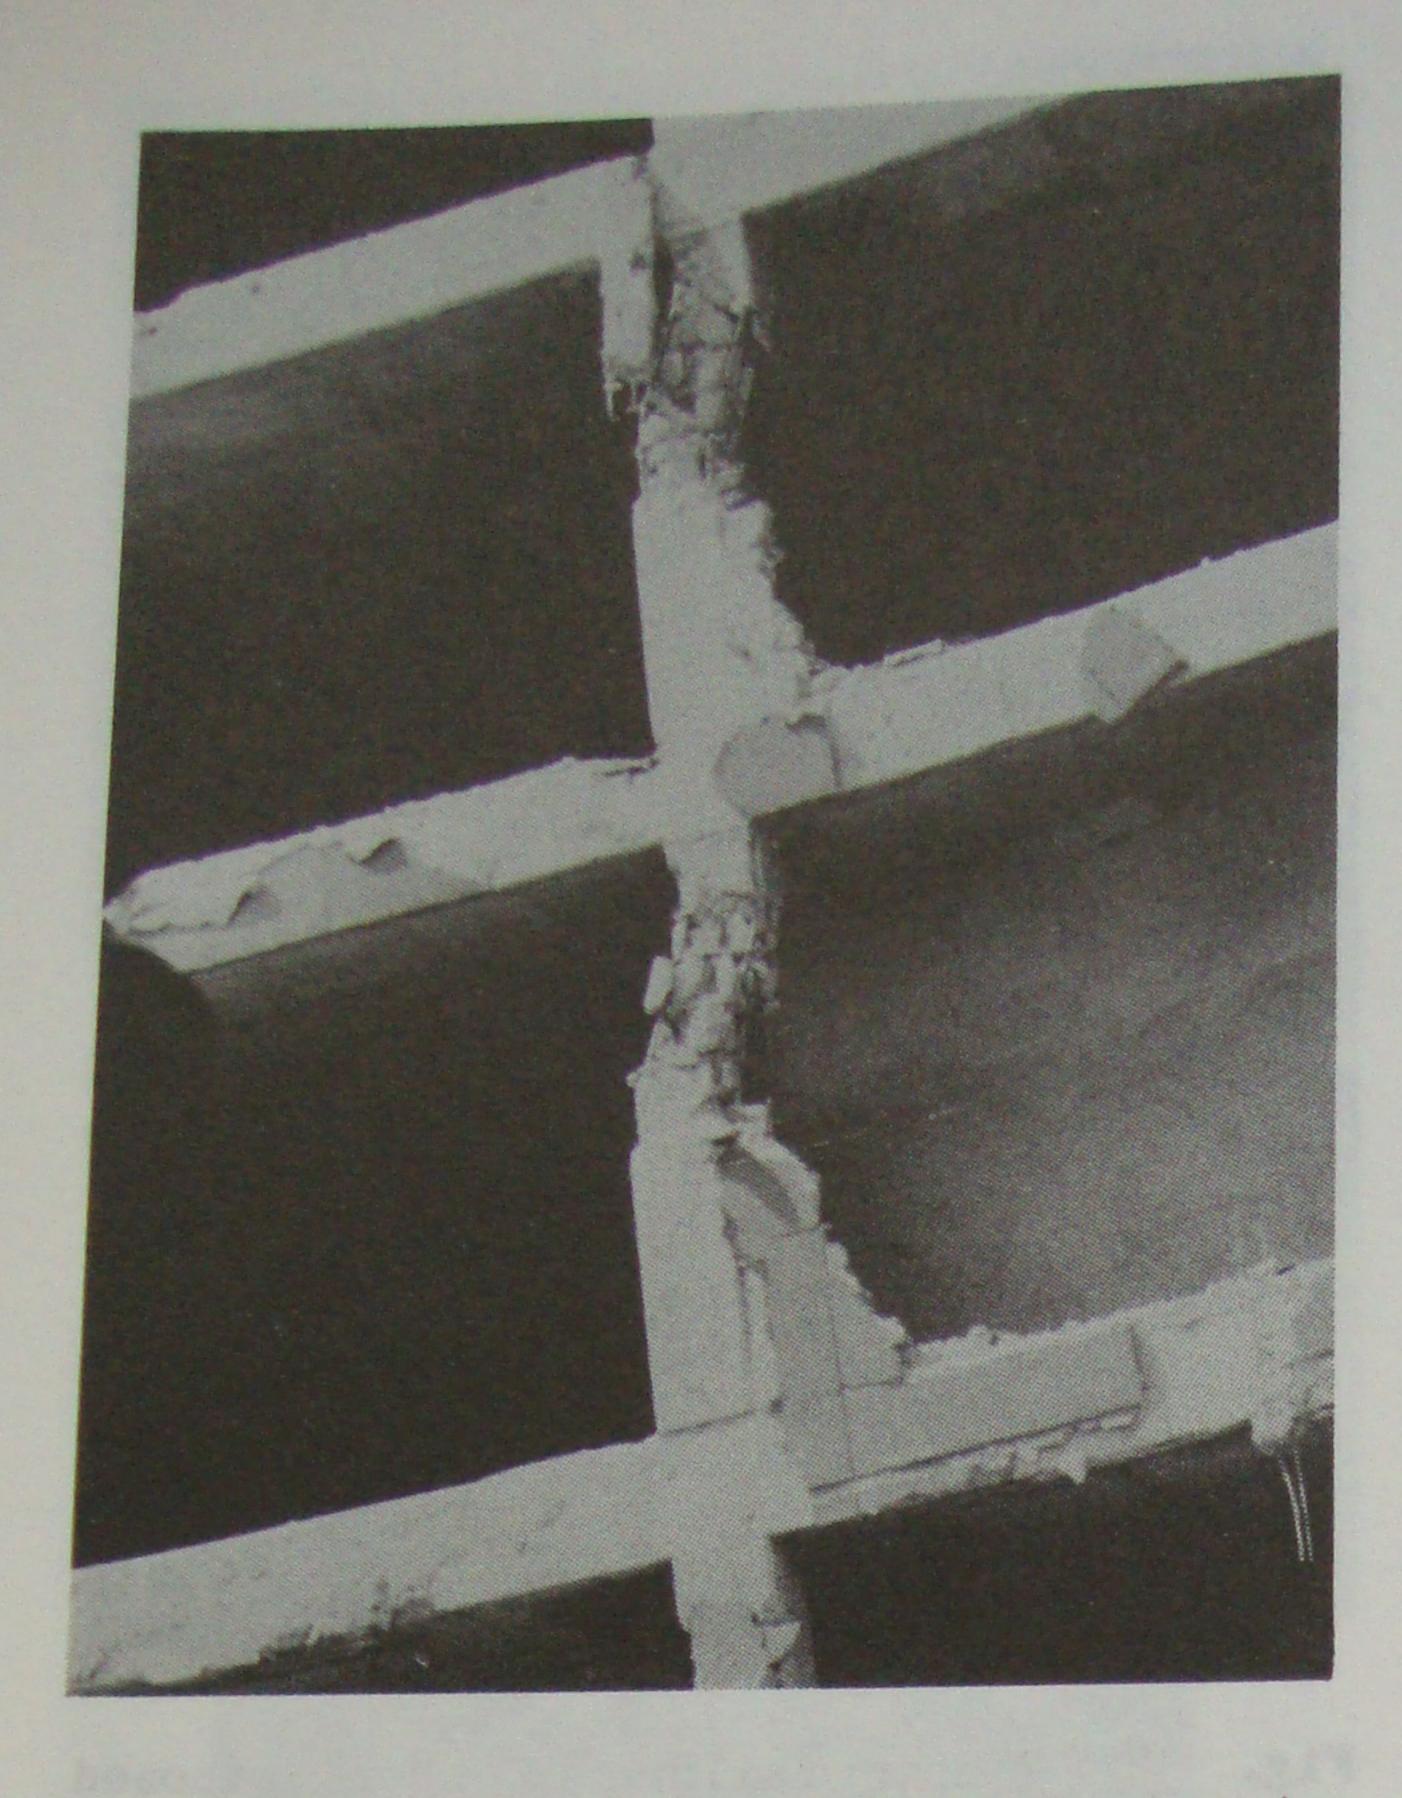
Short column failure due to presence of partial storey height masonry wall (Mitchell et al. 1986a&b).
